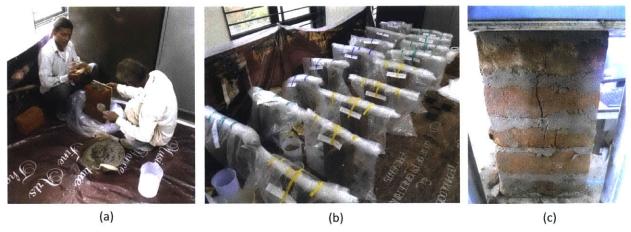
Local masons constructing prisms (a), curing masonry prism specimens (b), and a prism under compression testing (c) more details and experimentation photos can be found in Appendix C.
